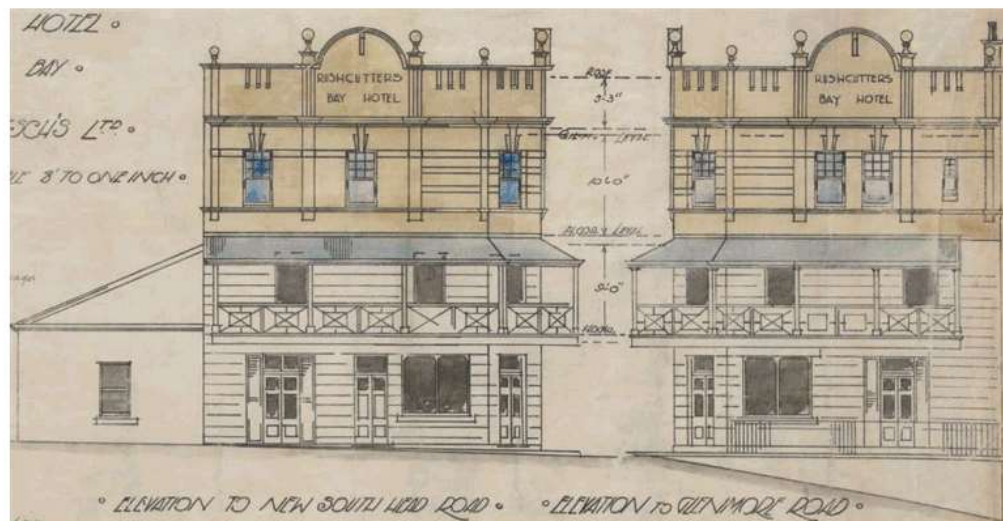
Detail of New South Head Road (L) and Glenmore Road (R) elevations, "Rushcutter [sic] Bay Hotel, New South Head Road, Paddington, Design of additions and alterations, basement and ground floor plan, front elevation, elevation to New South Head Road and section, Applicant/owner, Reschs Limited, Architect M Rigden, 70 Hunter Street, Sydney, Signed 30 March 1911" (Source: State Records and Archives Authority)
